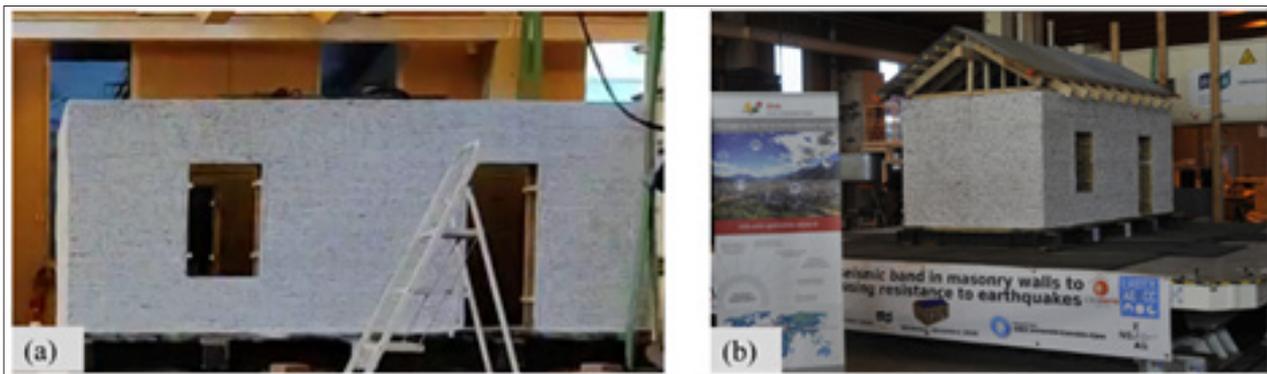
Positioning of the metal frame to fix it with the shake table (a), and roof installation on the building (b).
